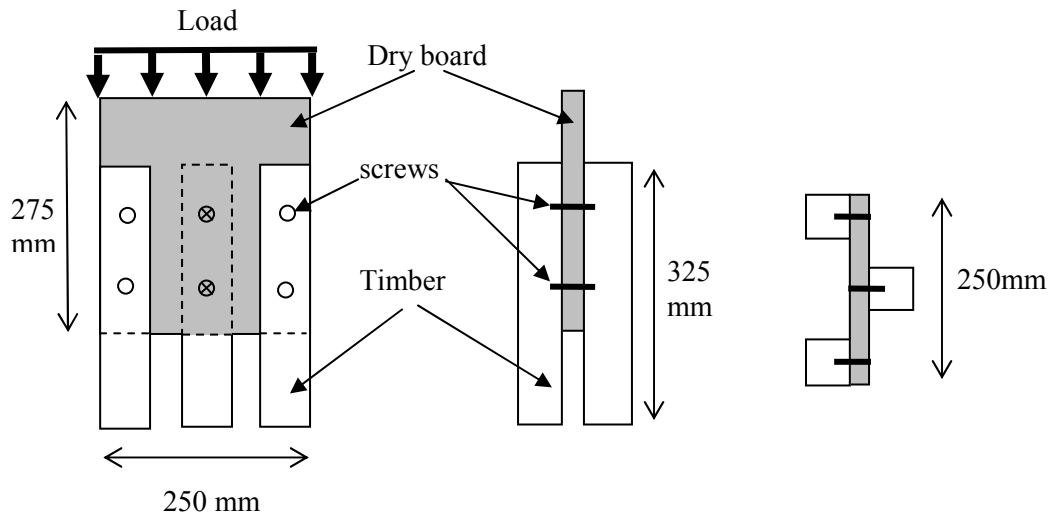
Schematic Drawing of Cemboard-Timber Specimen; Starting from the Left -Elevation, Side and Cross Sectional Views
